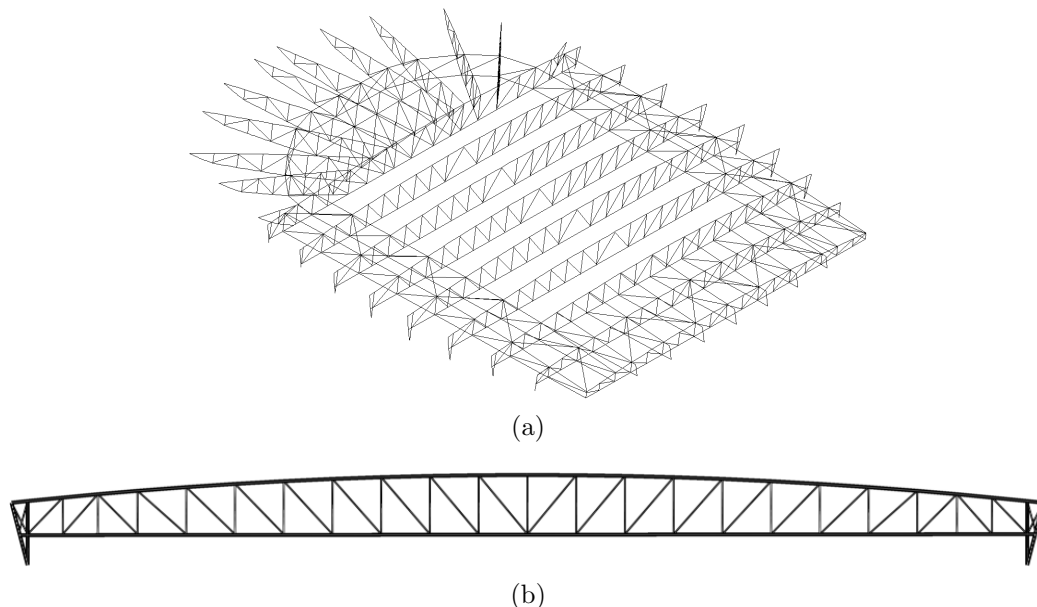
Initial manual design for 90m span exhibition hall roof: (a) 3D view; (b) elevation of sample 2D truss
